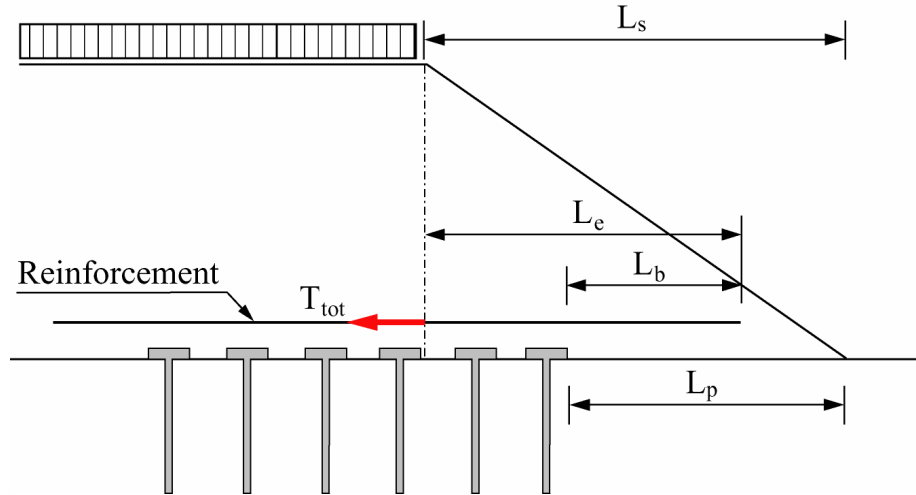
The bond length according to transverse sliding across the bank and the pull-out length of the reinforcement
